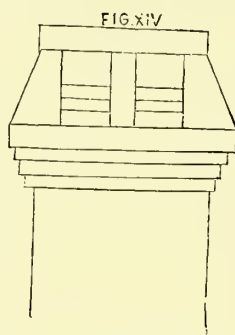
Front and sectional view of a chimney constructed so as to avoid downward drafts.
